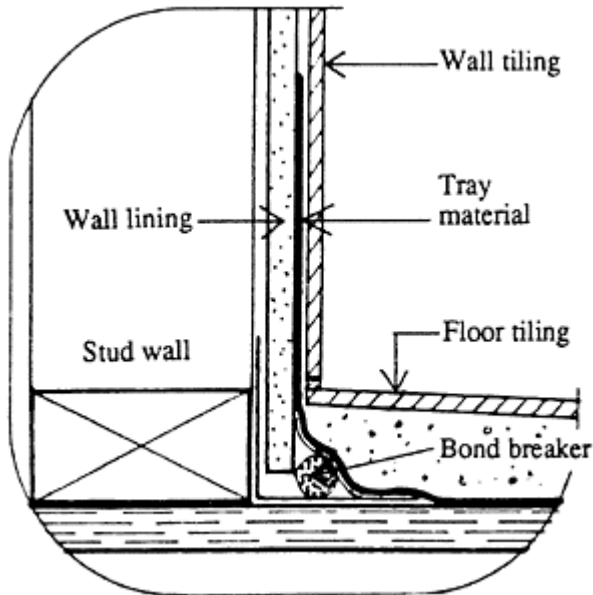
An internal tray system. Wall lining passes outside the tray.
